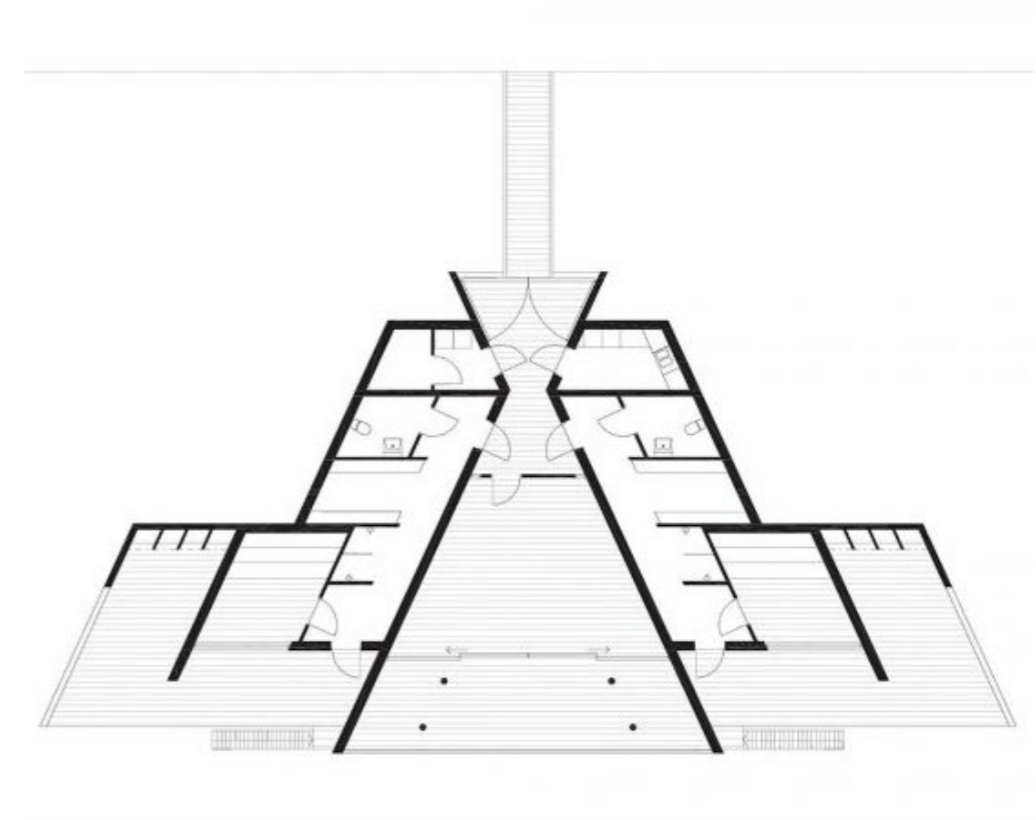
Karlshamn Cold Bath House floor plan. (White Arkitekter, n.d.).
